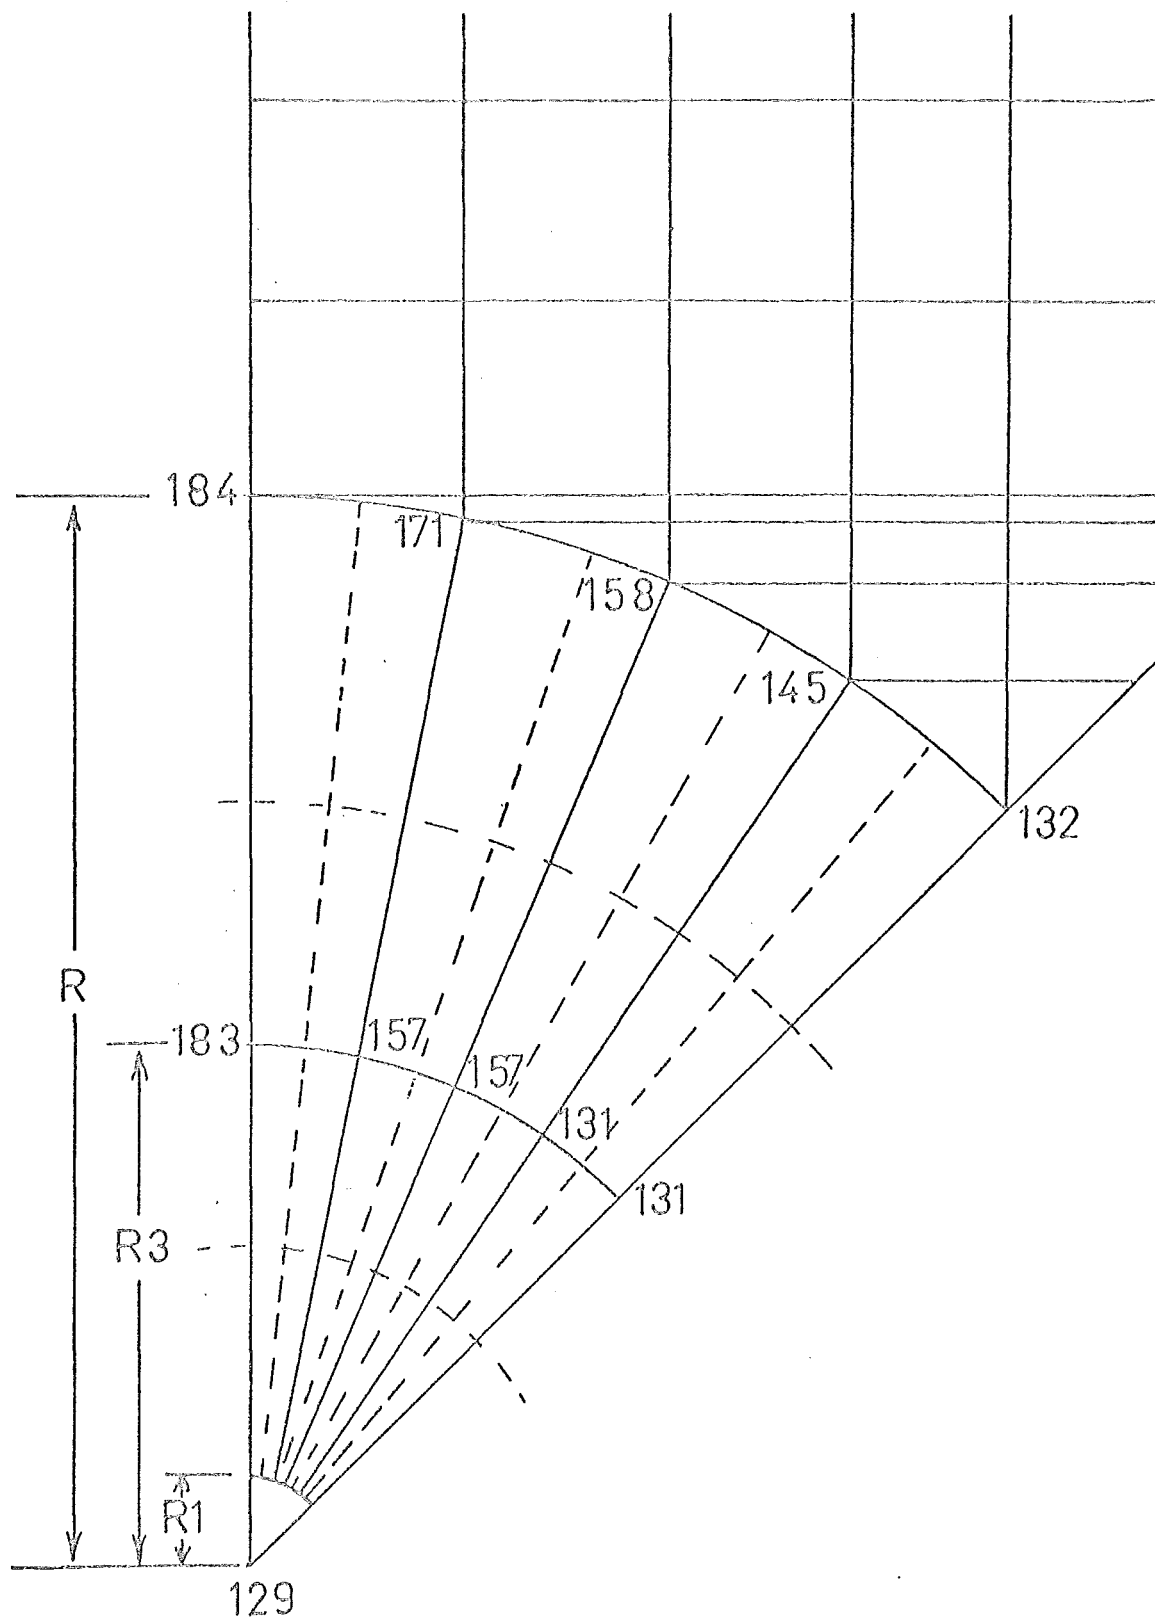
PLAN VIEW OF AIR CONDUCTION
